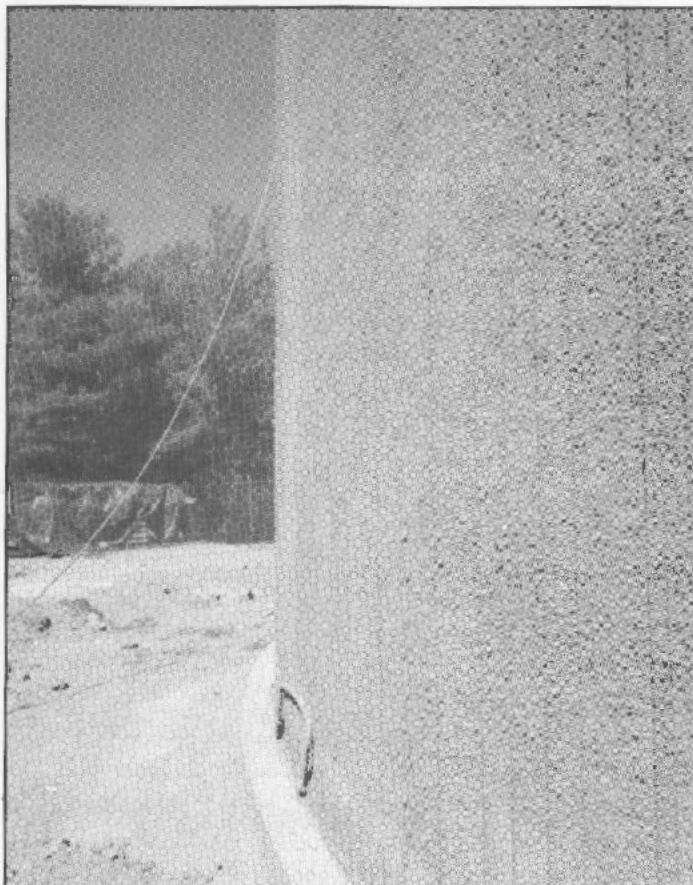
Tank Exterior After Shotcrete Coat Over Diaphragm
